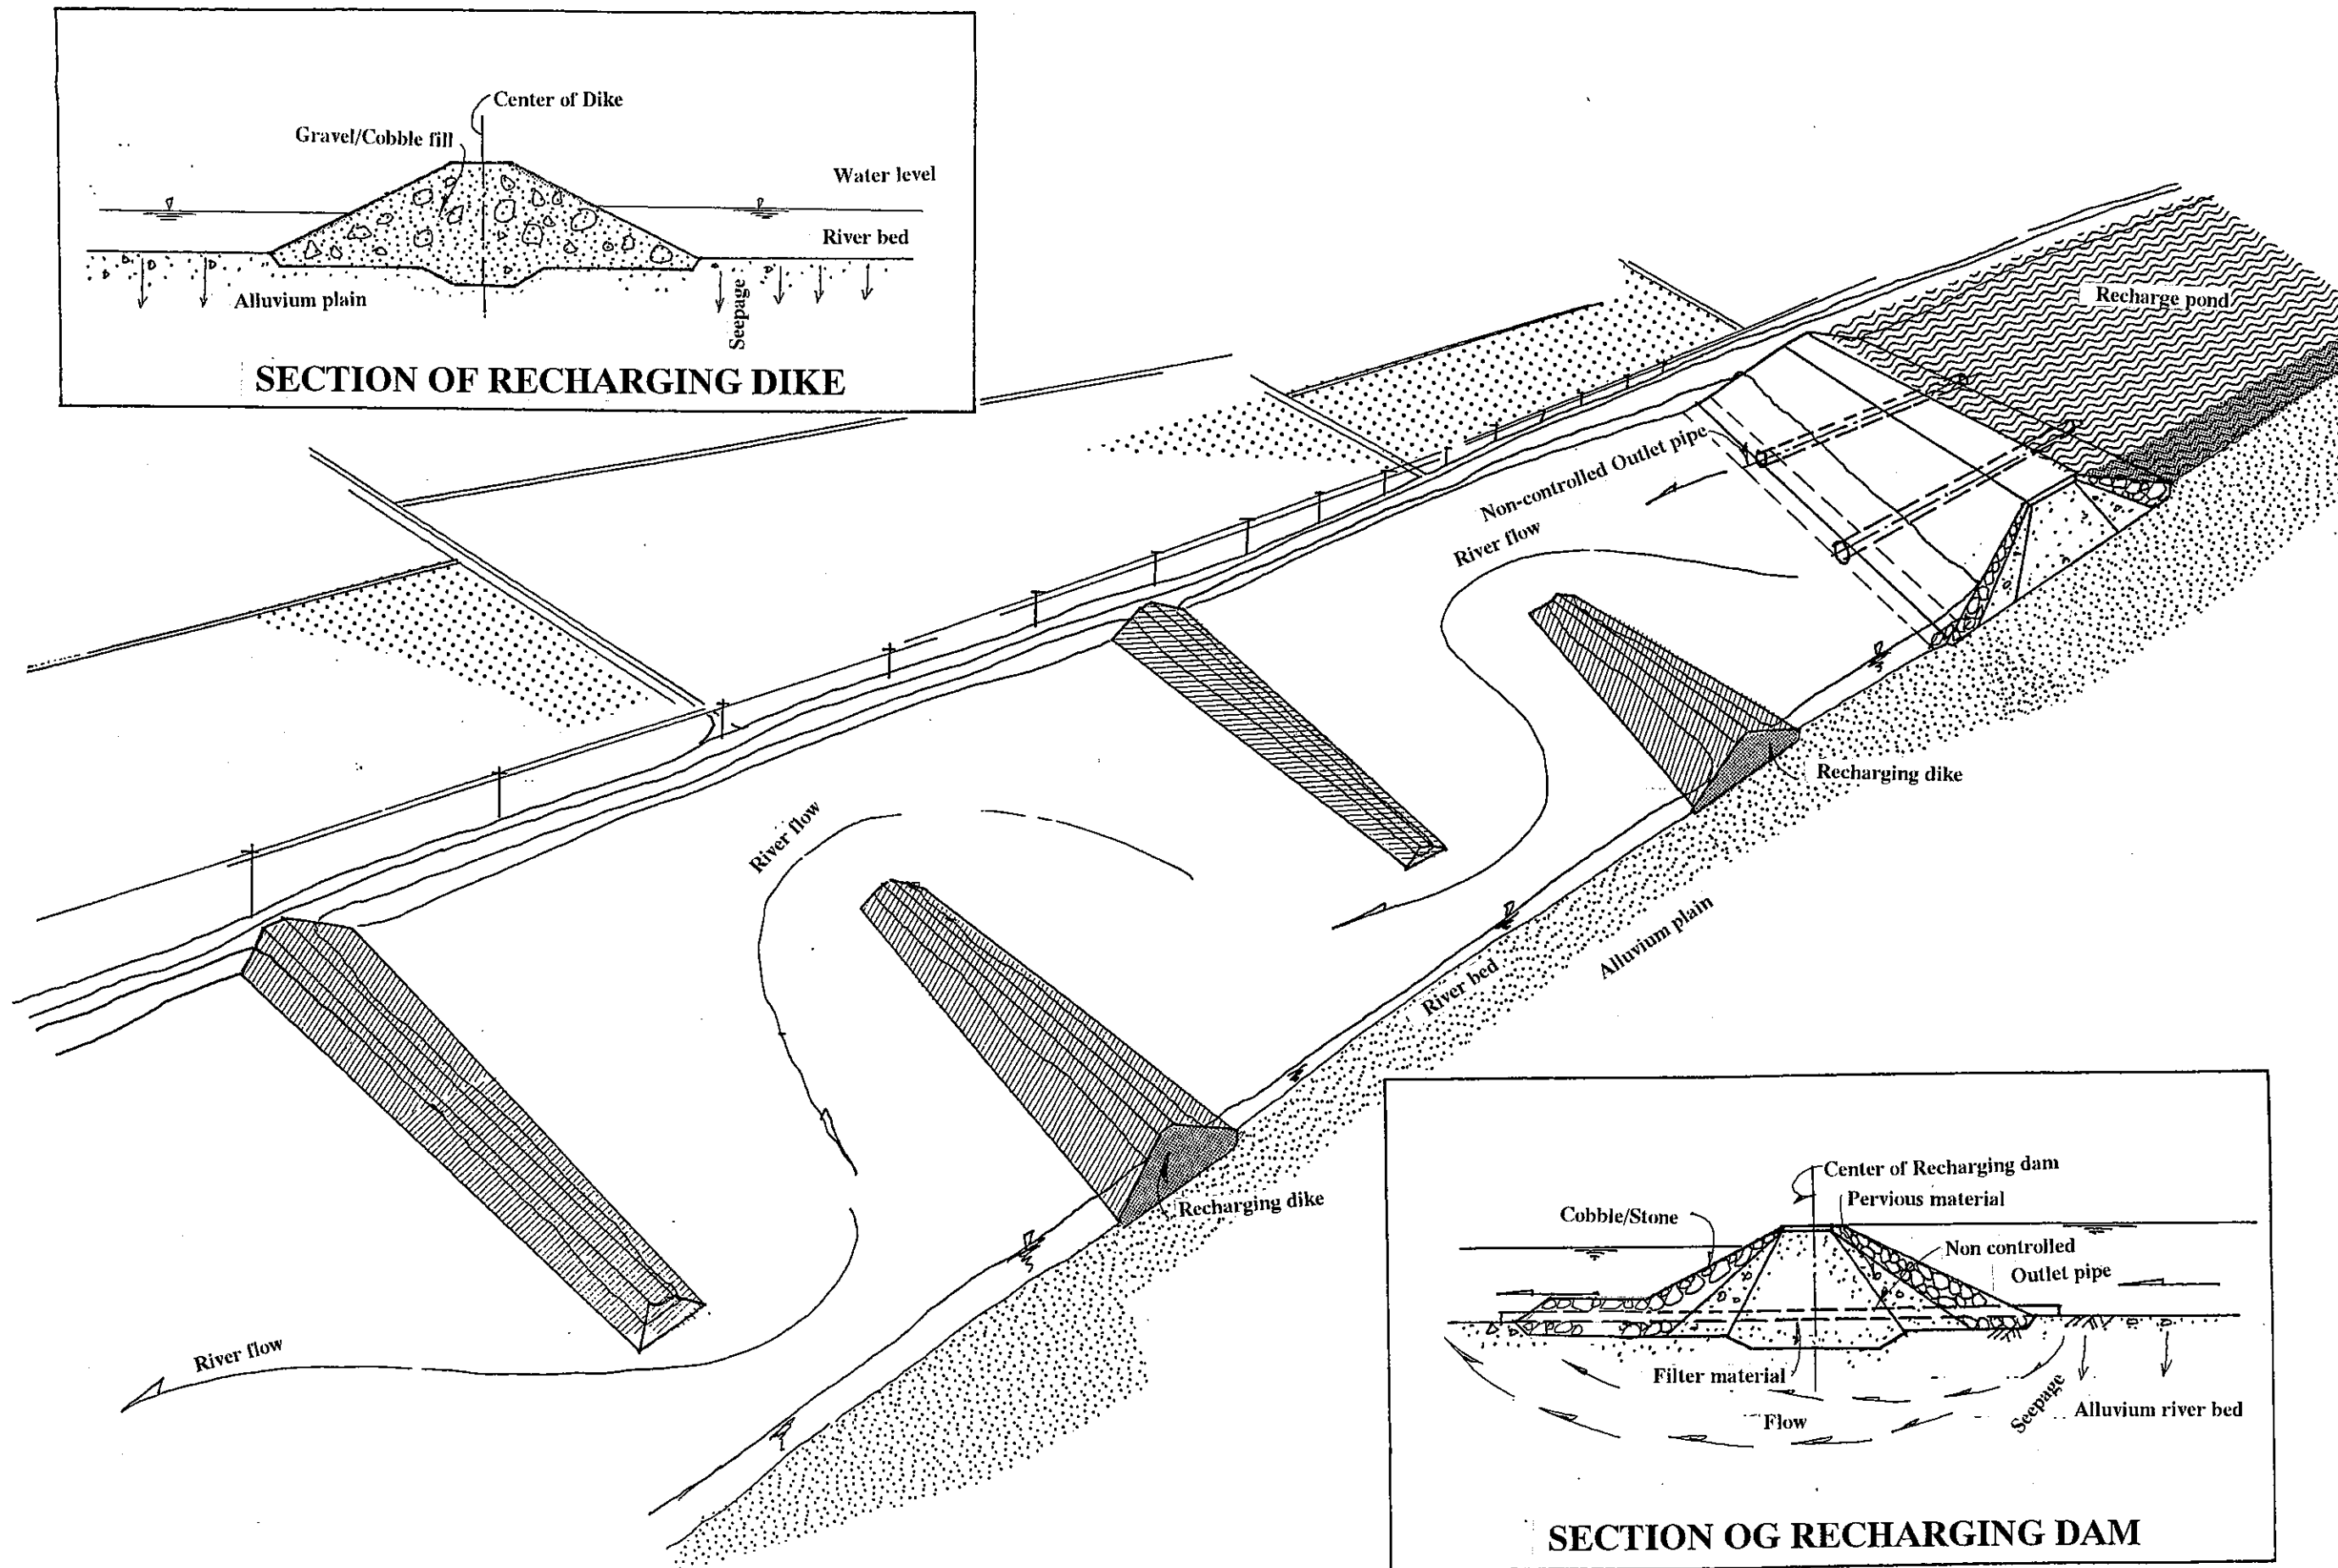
Groundwater Recharge Facilities Plan (1)
